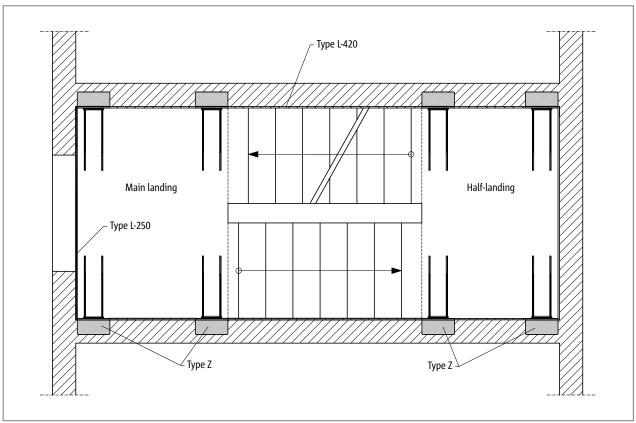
Schöck Tronsole® type Z: Element configuration in plan view
